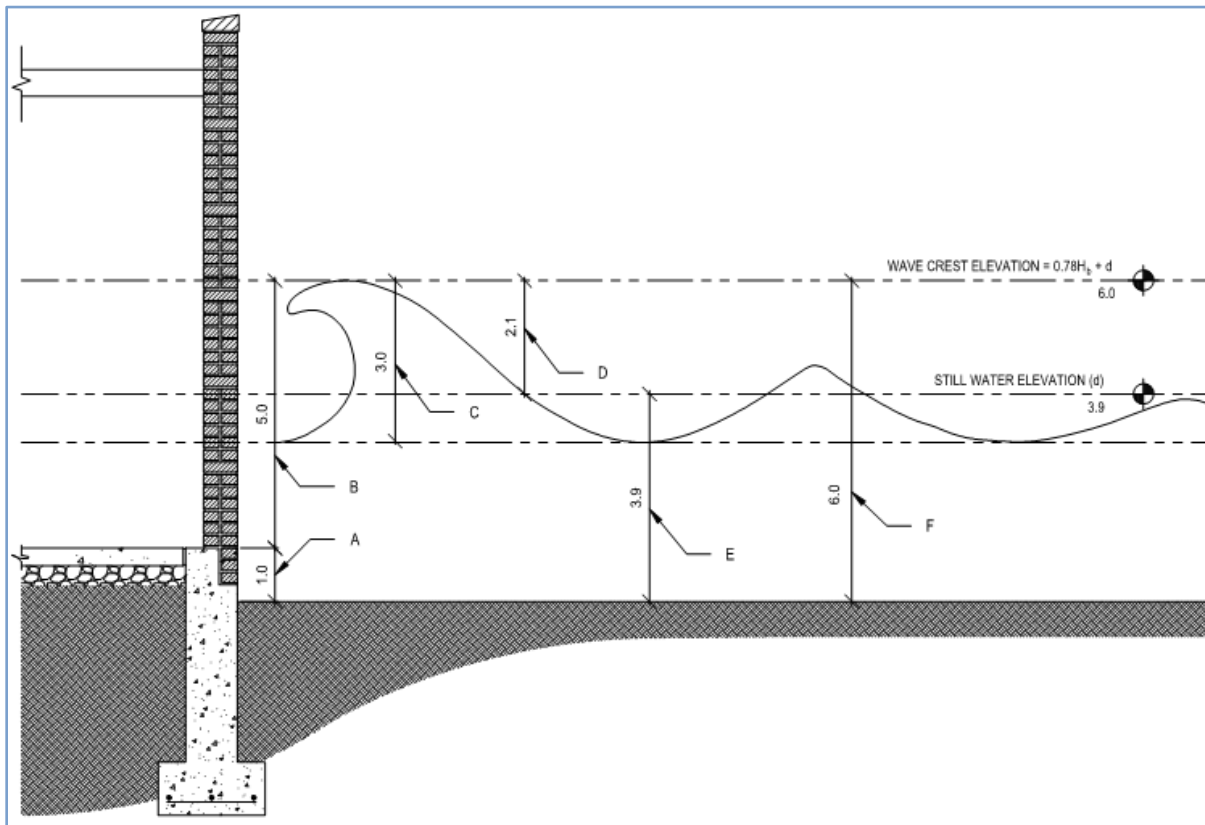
Illustration of Maximum Wave Damage Scenario, Prototype 1A-1 Most Likely Building Characteristics, Slab Foundation
